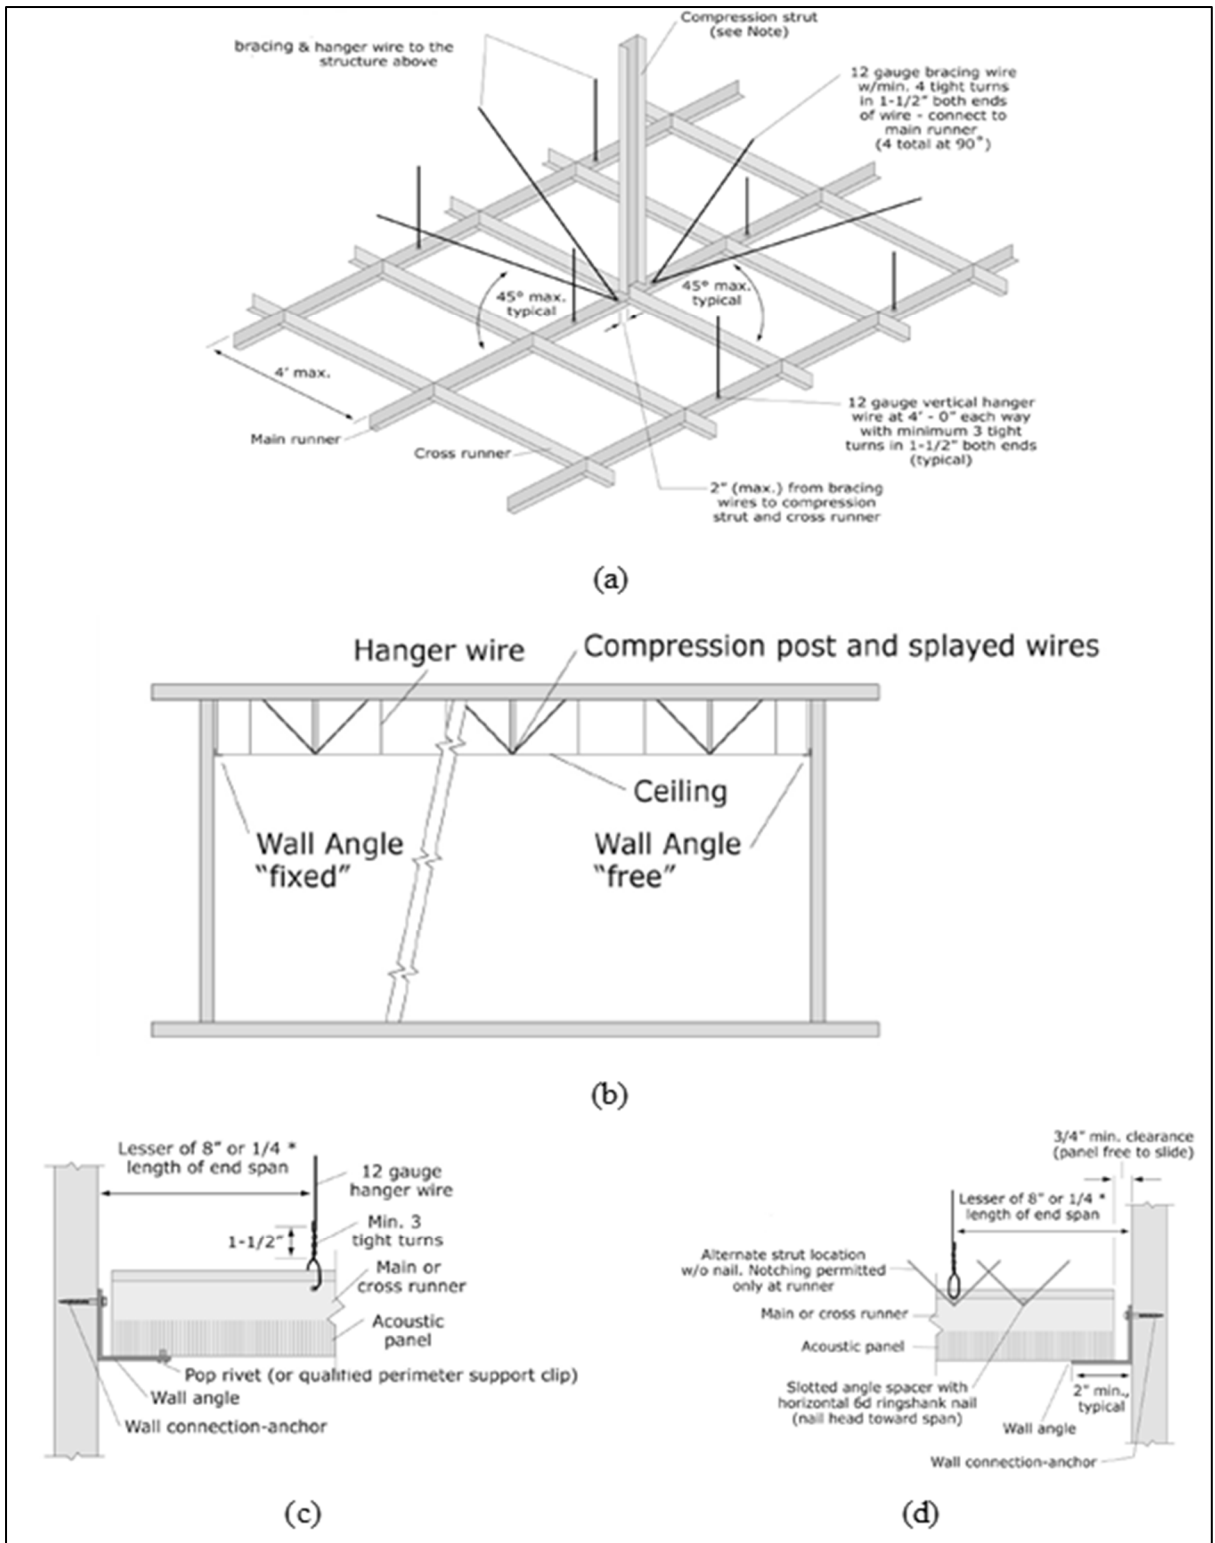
Typical acoustic lay-in panel suspended ceilings: a) general configuration; b) transversal section; c) fix connection to adjacent wall; (d) free connection adjacent wall
